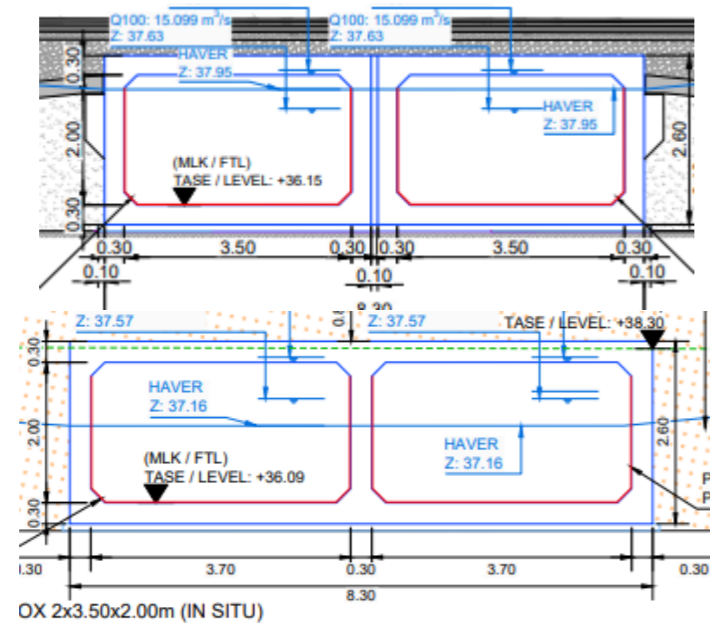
Culver CU0381. Cross section over BR0060 tunnel
